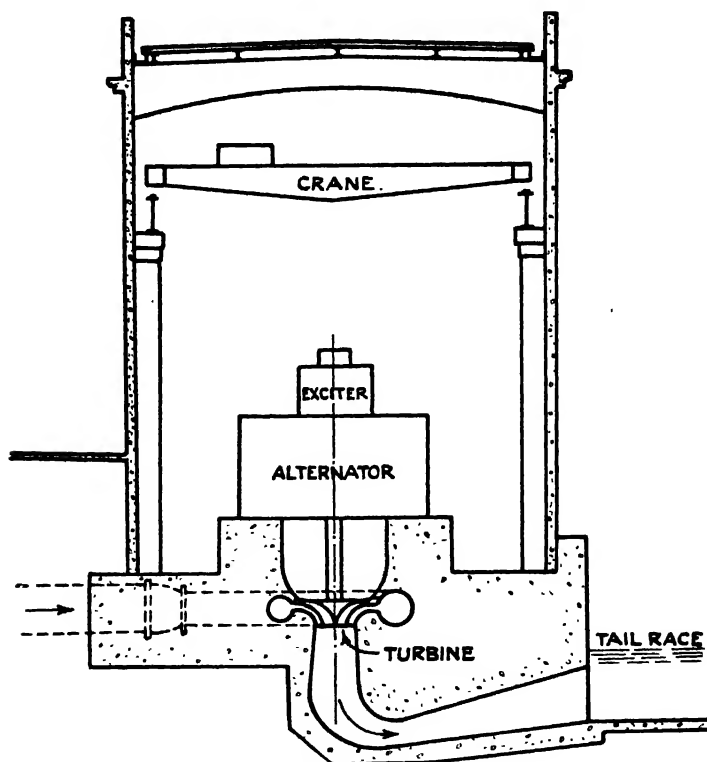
32.5 MW, 910 ft. Head Francis Turbine.
